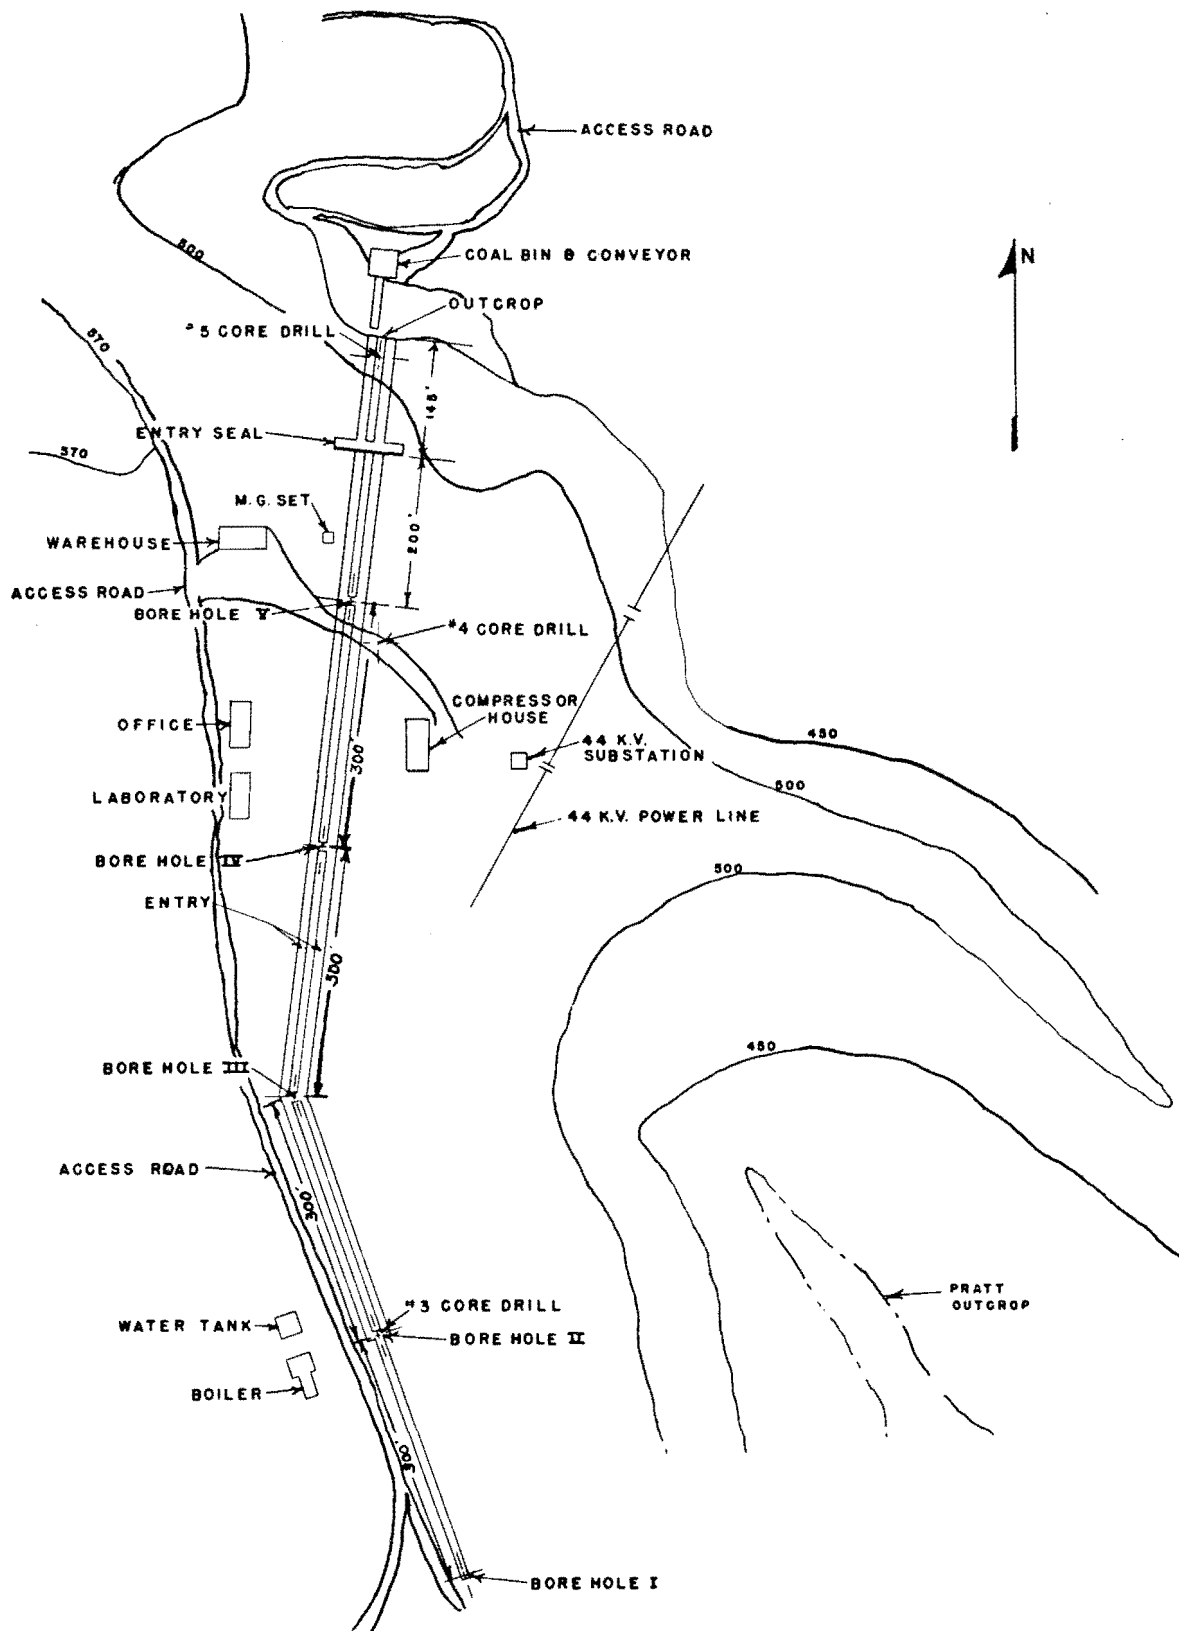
Plant Layout, Plan of Underground Gasification Project.
